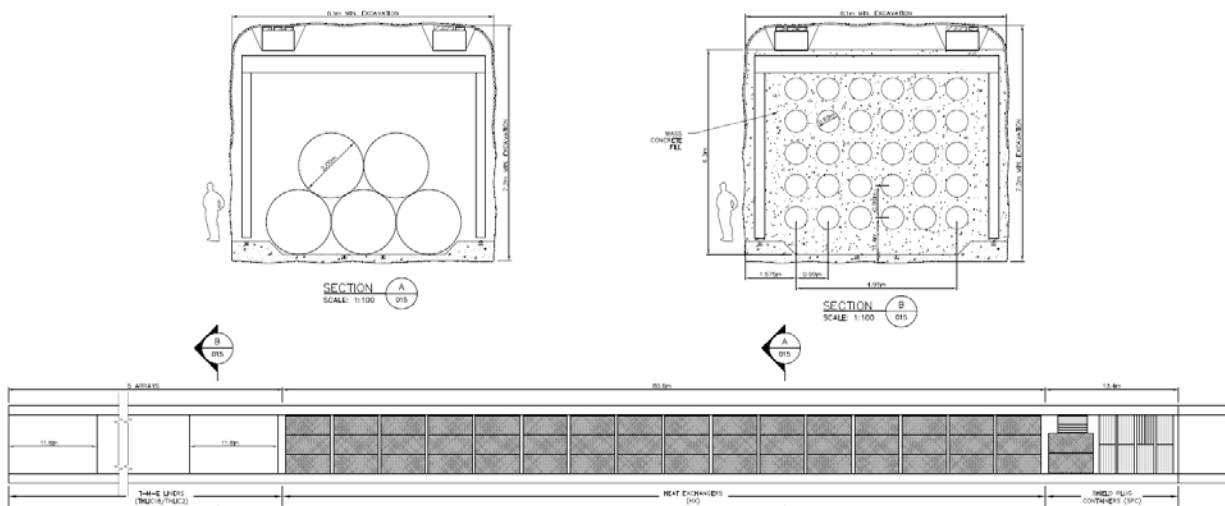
Stacking Arrangements for E-A Emplacement Rooms in the East Panel (Hatch 2008)
